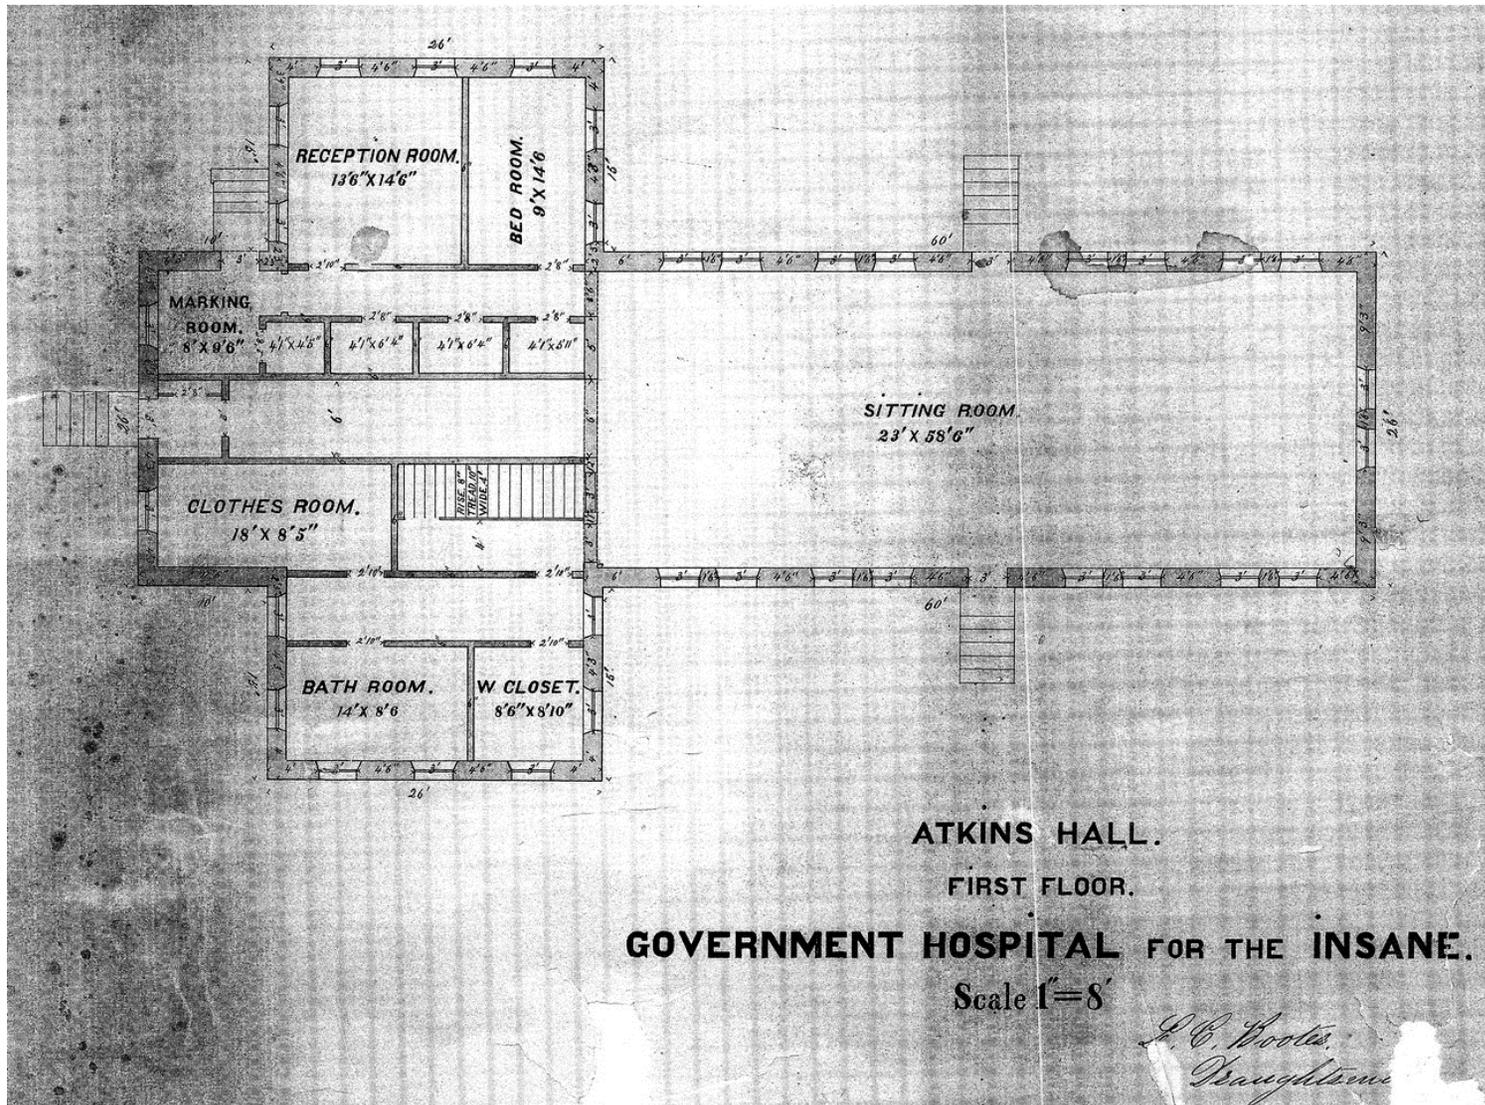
First floor drawing of Atkins Hall, undated. Source: GSA archive, image DC1343SE0108.
